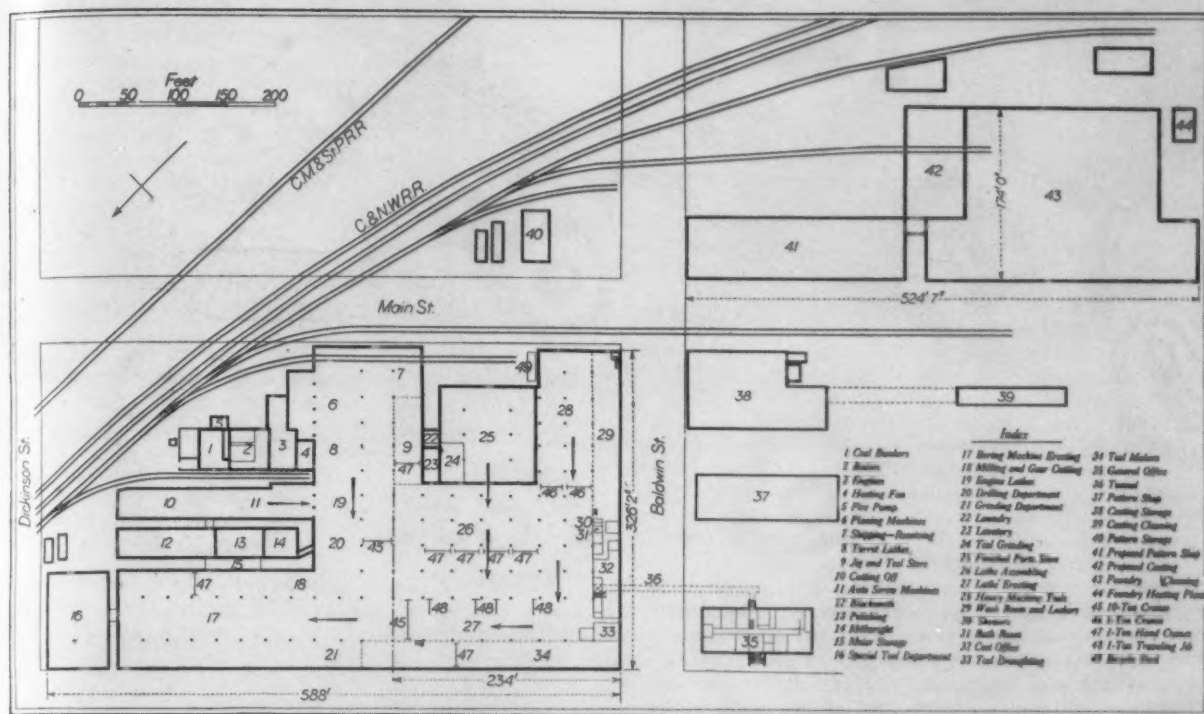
Block Plan of the Plant of the Gisholt Machine Company
